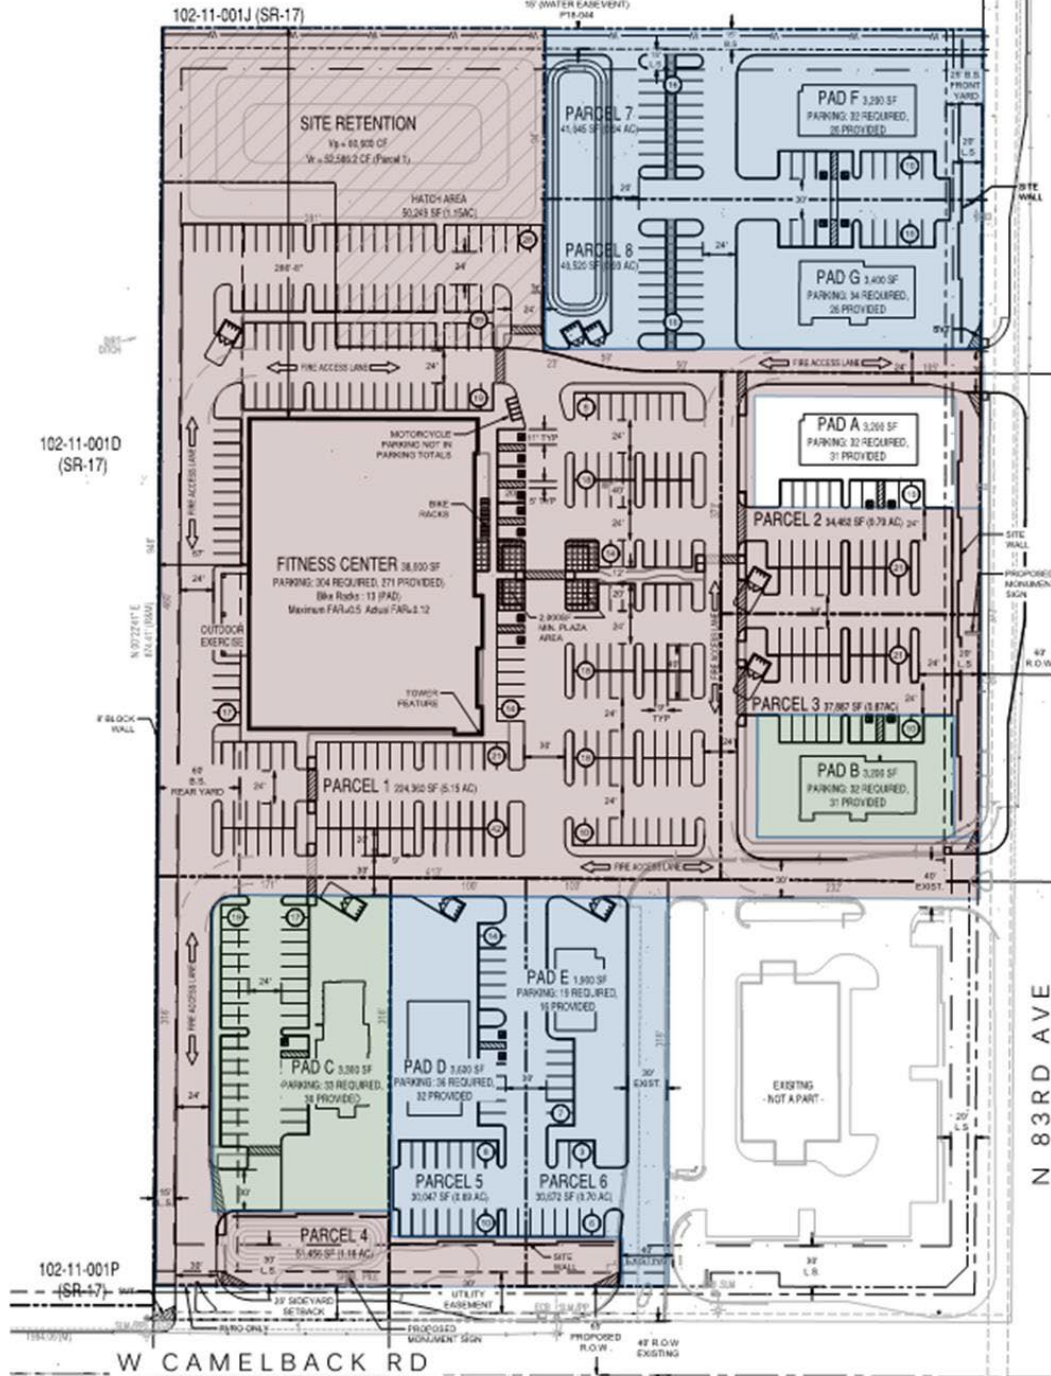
CONCEPTUAL SITE PLAN
